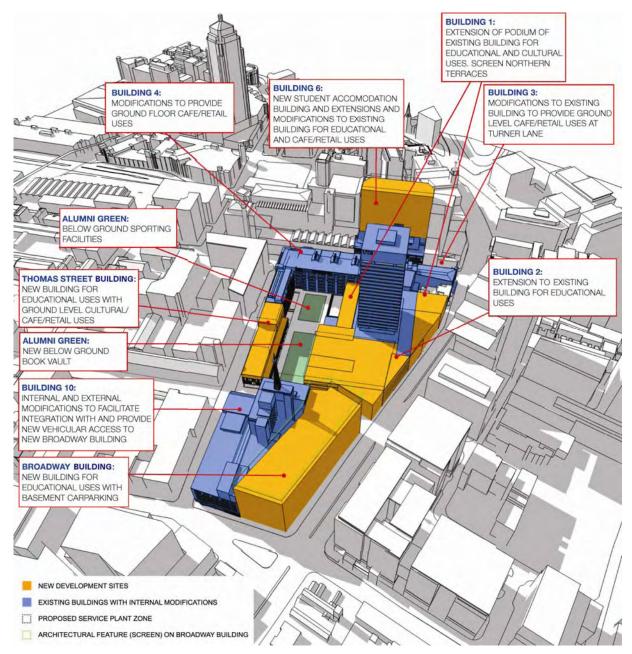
3D Model of building envelopes (Source: BVN, DCM and JBA)
